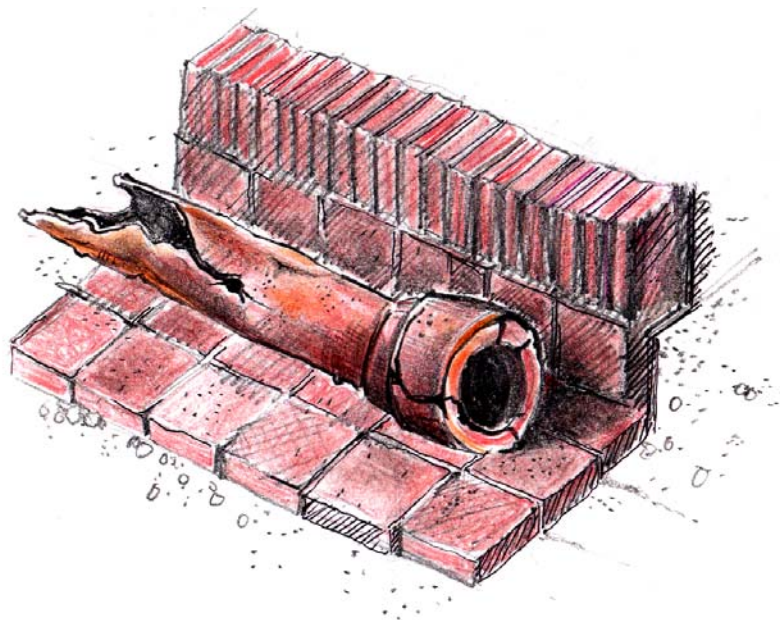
the clay pipes was fixed over brick soling works and a tunnel cavity used to build with brick works to protect the clay terracotta pipes for sewerage system. Source: drawn by Sajid Bin DOZA
